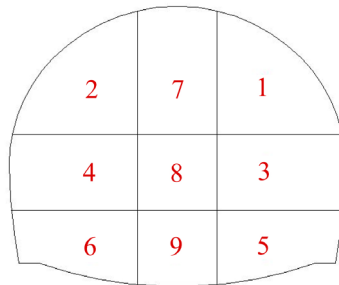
Double-side wall vertical excavation construction step sequence diagram
